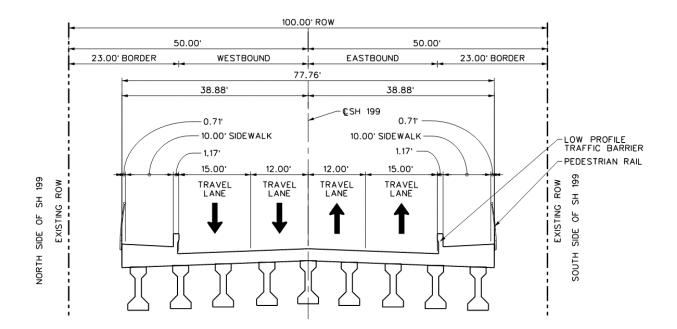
Recommended Typical Bridge Section at the West Fork of the Trinity River
